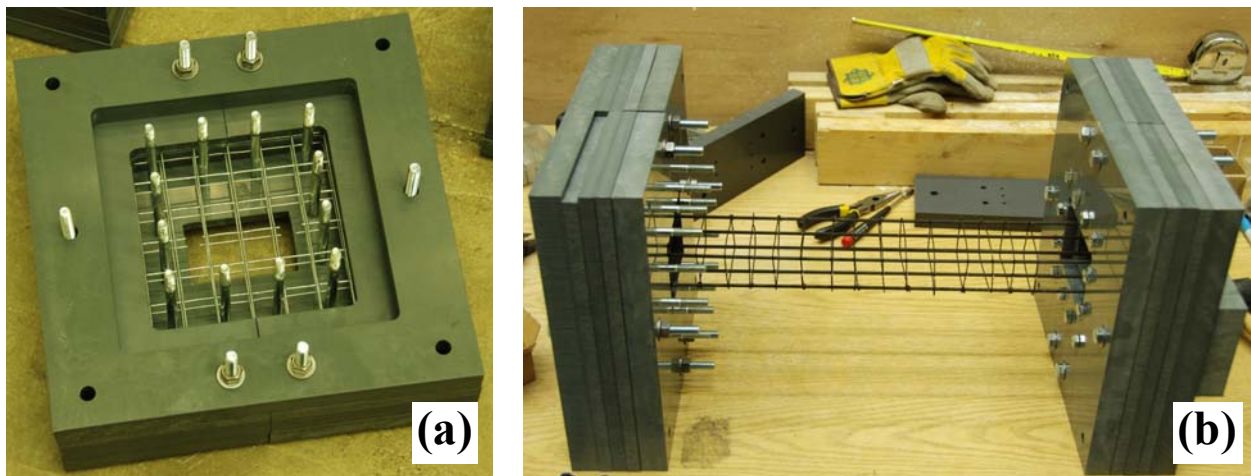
(a) Mesh reinforcement inside the end-caps, and (b) connecting the reinforcement to formwork
